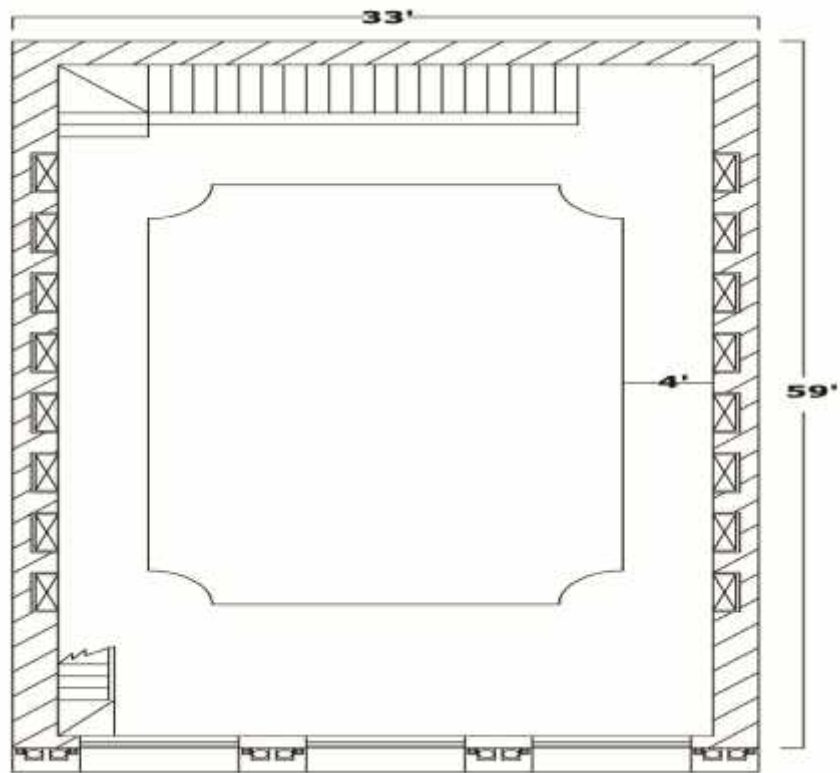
First floor plan (courtesy: Mr. Adnan Anwar)
